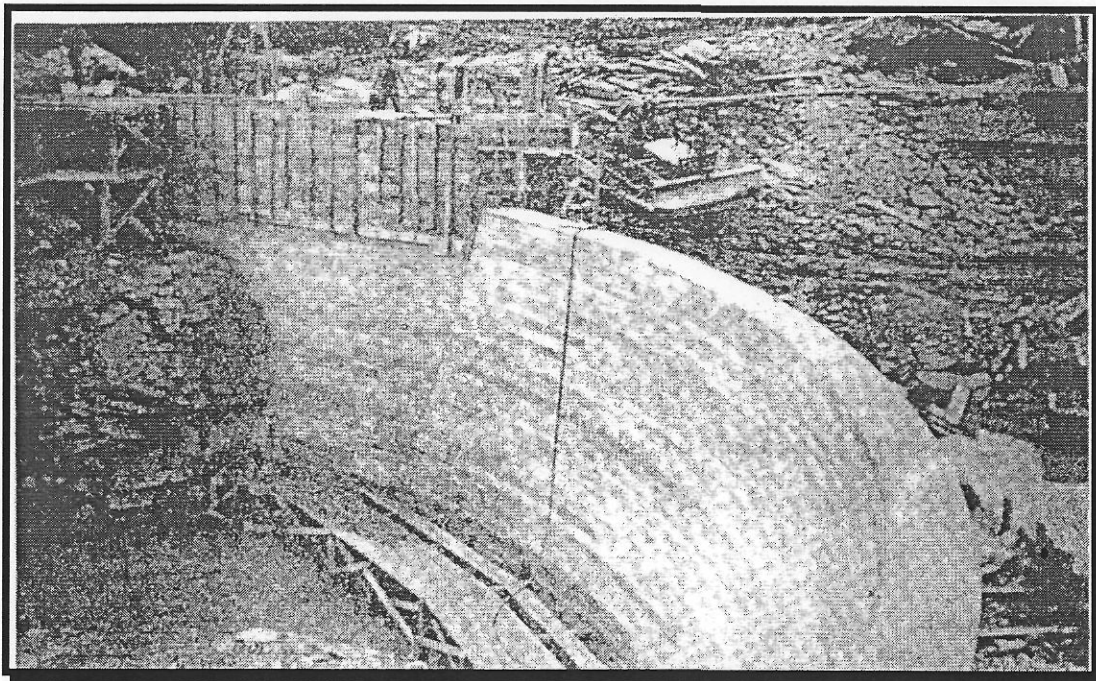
Concrete Dam at the Outlet of Long Lake Under Construction, 1936
